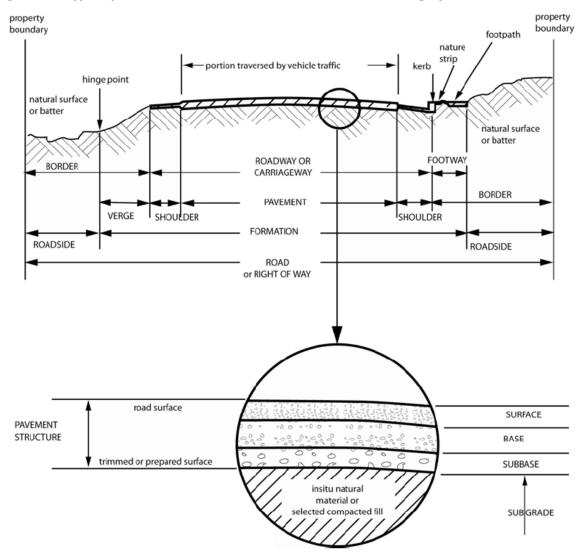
Typical pavement structure within the context of road design (Source: Austroads 2009c)
